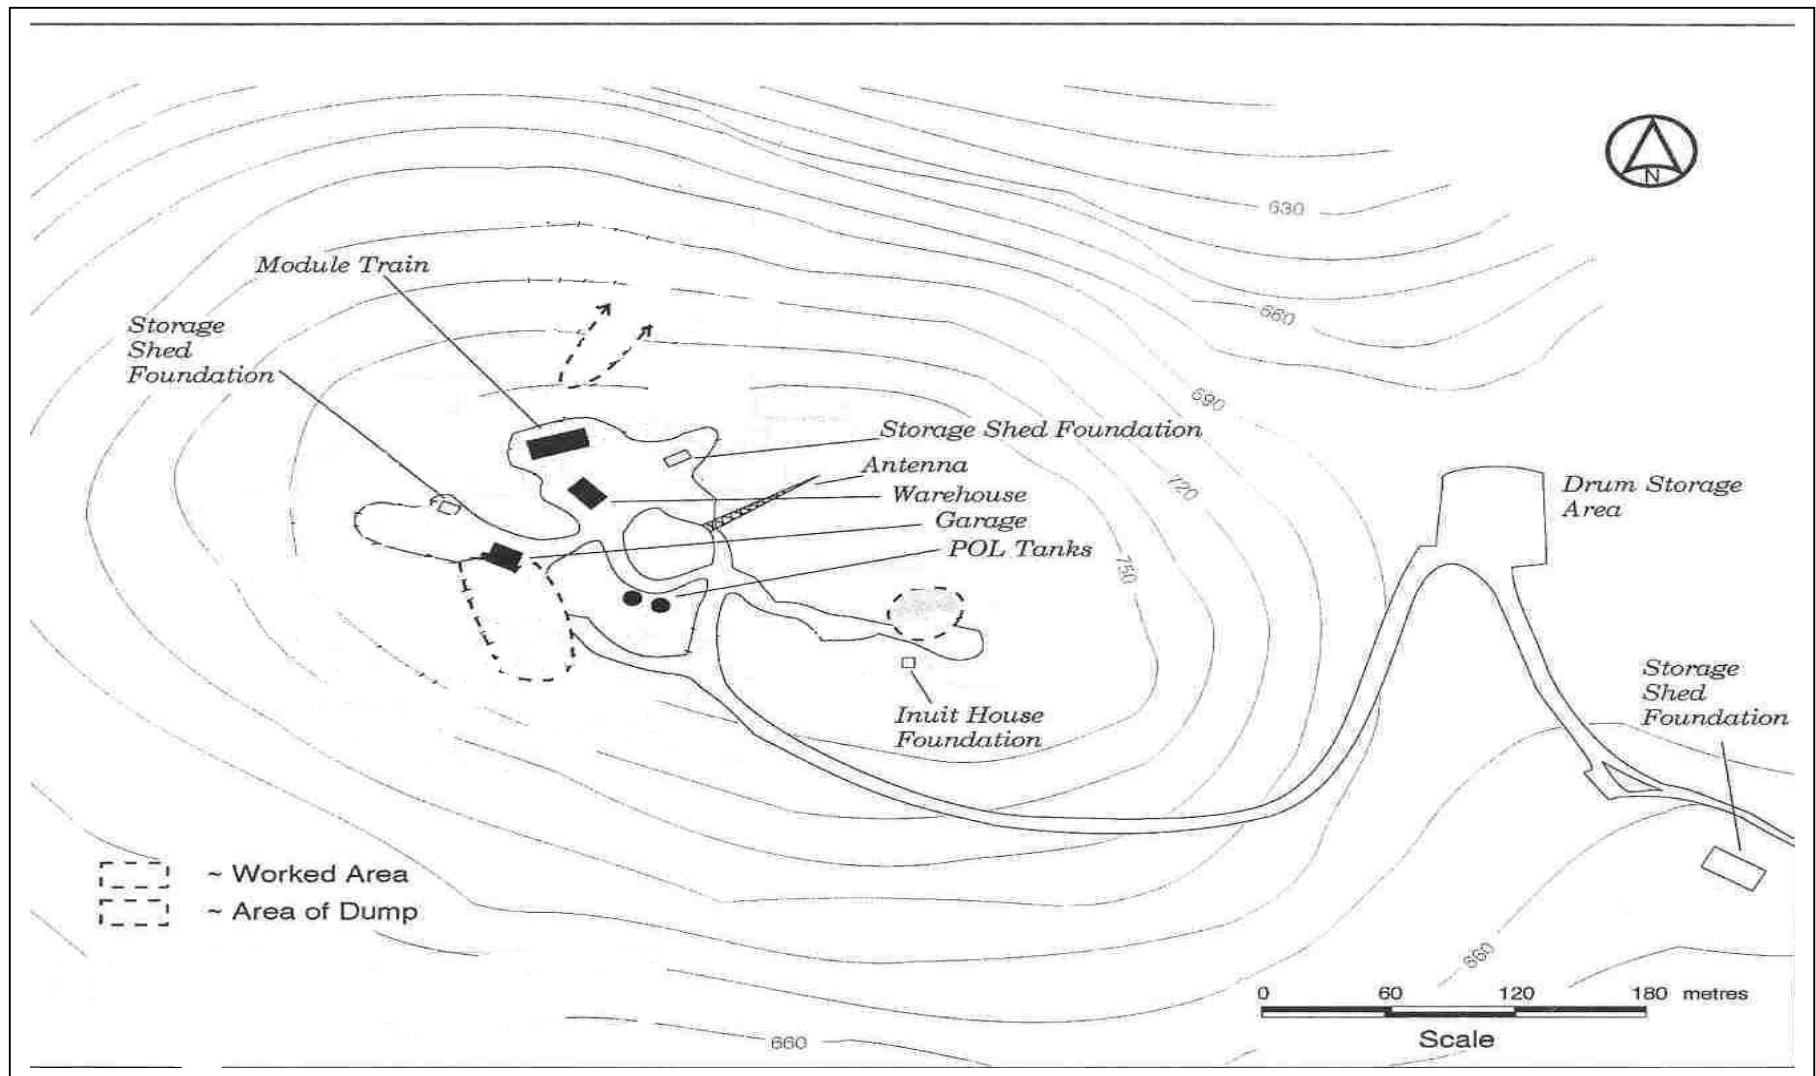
Upper Site Layout of FOX-C DEW Line Site
